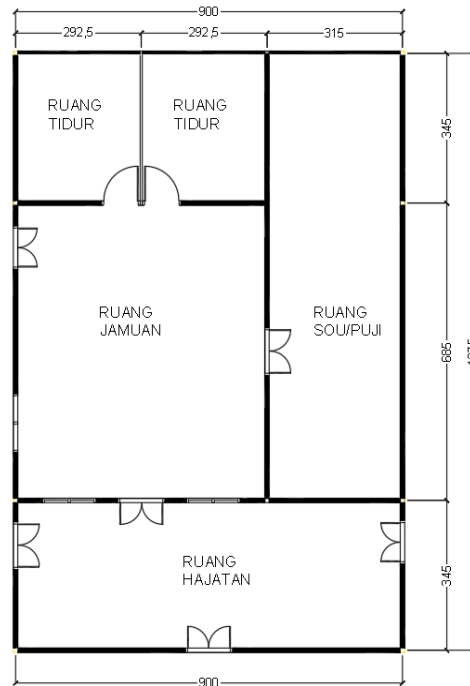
Layout Plan of the Traditional Langkie Jiku Sorabi House (Source: Authors, 2025)
